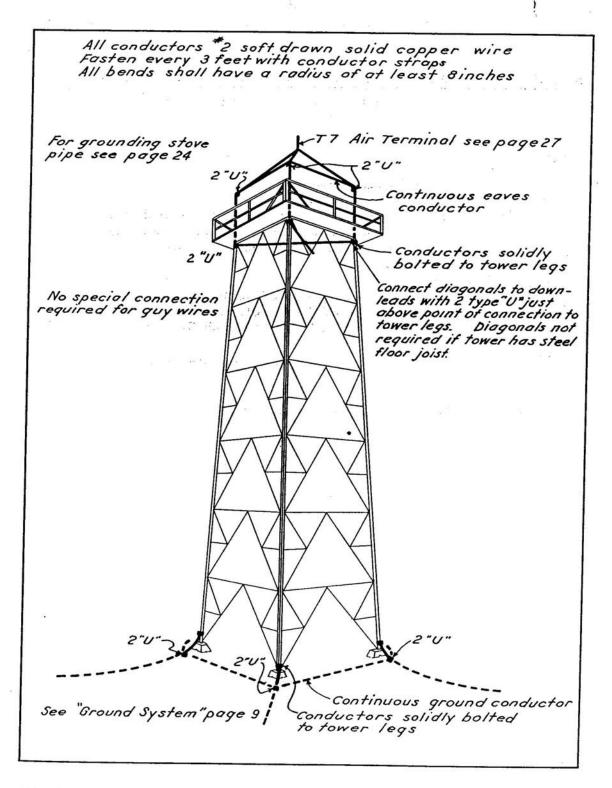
Steel tower with 14- by 14-foot or hip-roofed wood cab.
